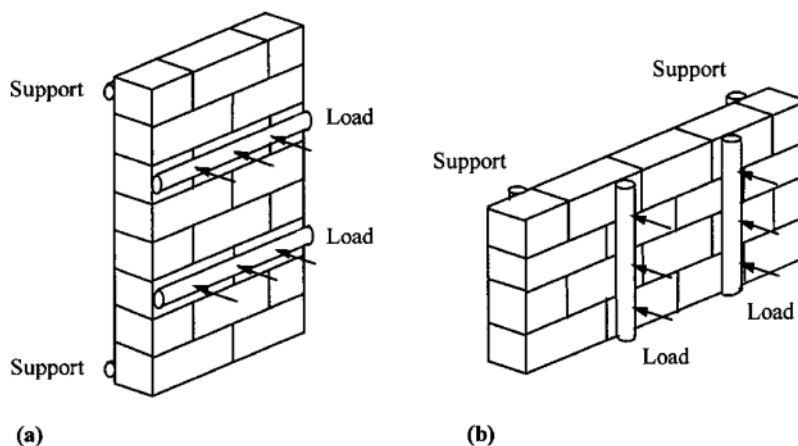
Flexural strength test on masonry wallette. a) Loading parallel to the bed joints. b) Loading perpendicular to the bed joints.[41]
